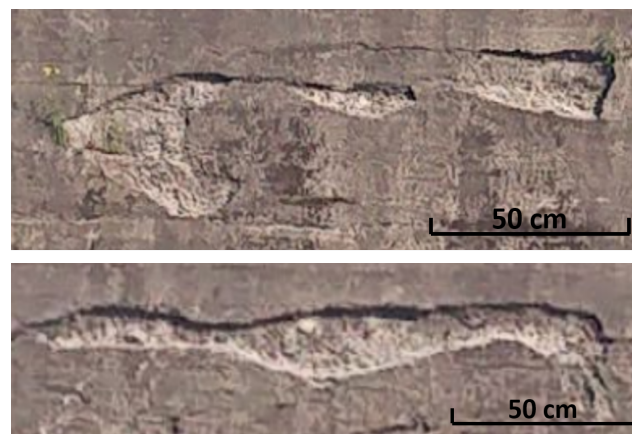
Two examples of damaged areas in the real dataset. Both pictures show the concrete spalling damage. The upper image shows three smaller damages with a size of up to 50 cm × 50 cm. The lower image shows larger spalling damage, which is 1.5 m in width and 30 cm in height.
